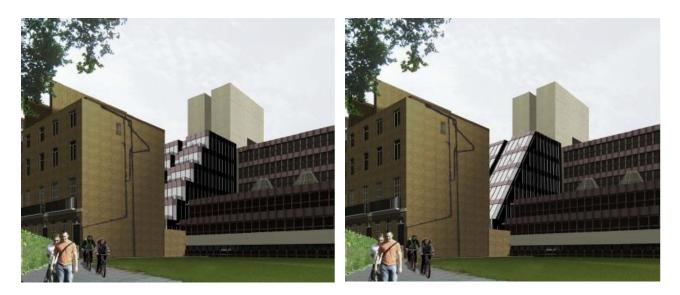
Proposed Design Change to Profile of Spur (Source: DAS Addendum)
